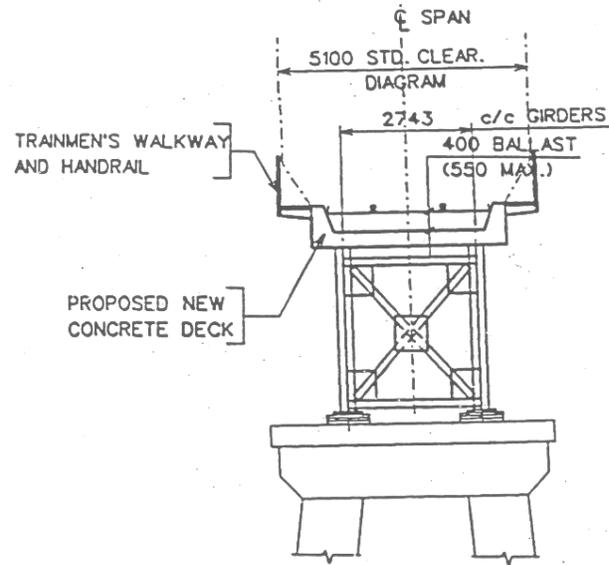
Steel deck plate girder railway bridge with prefabricated prestressed concrete slab.
